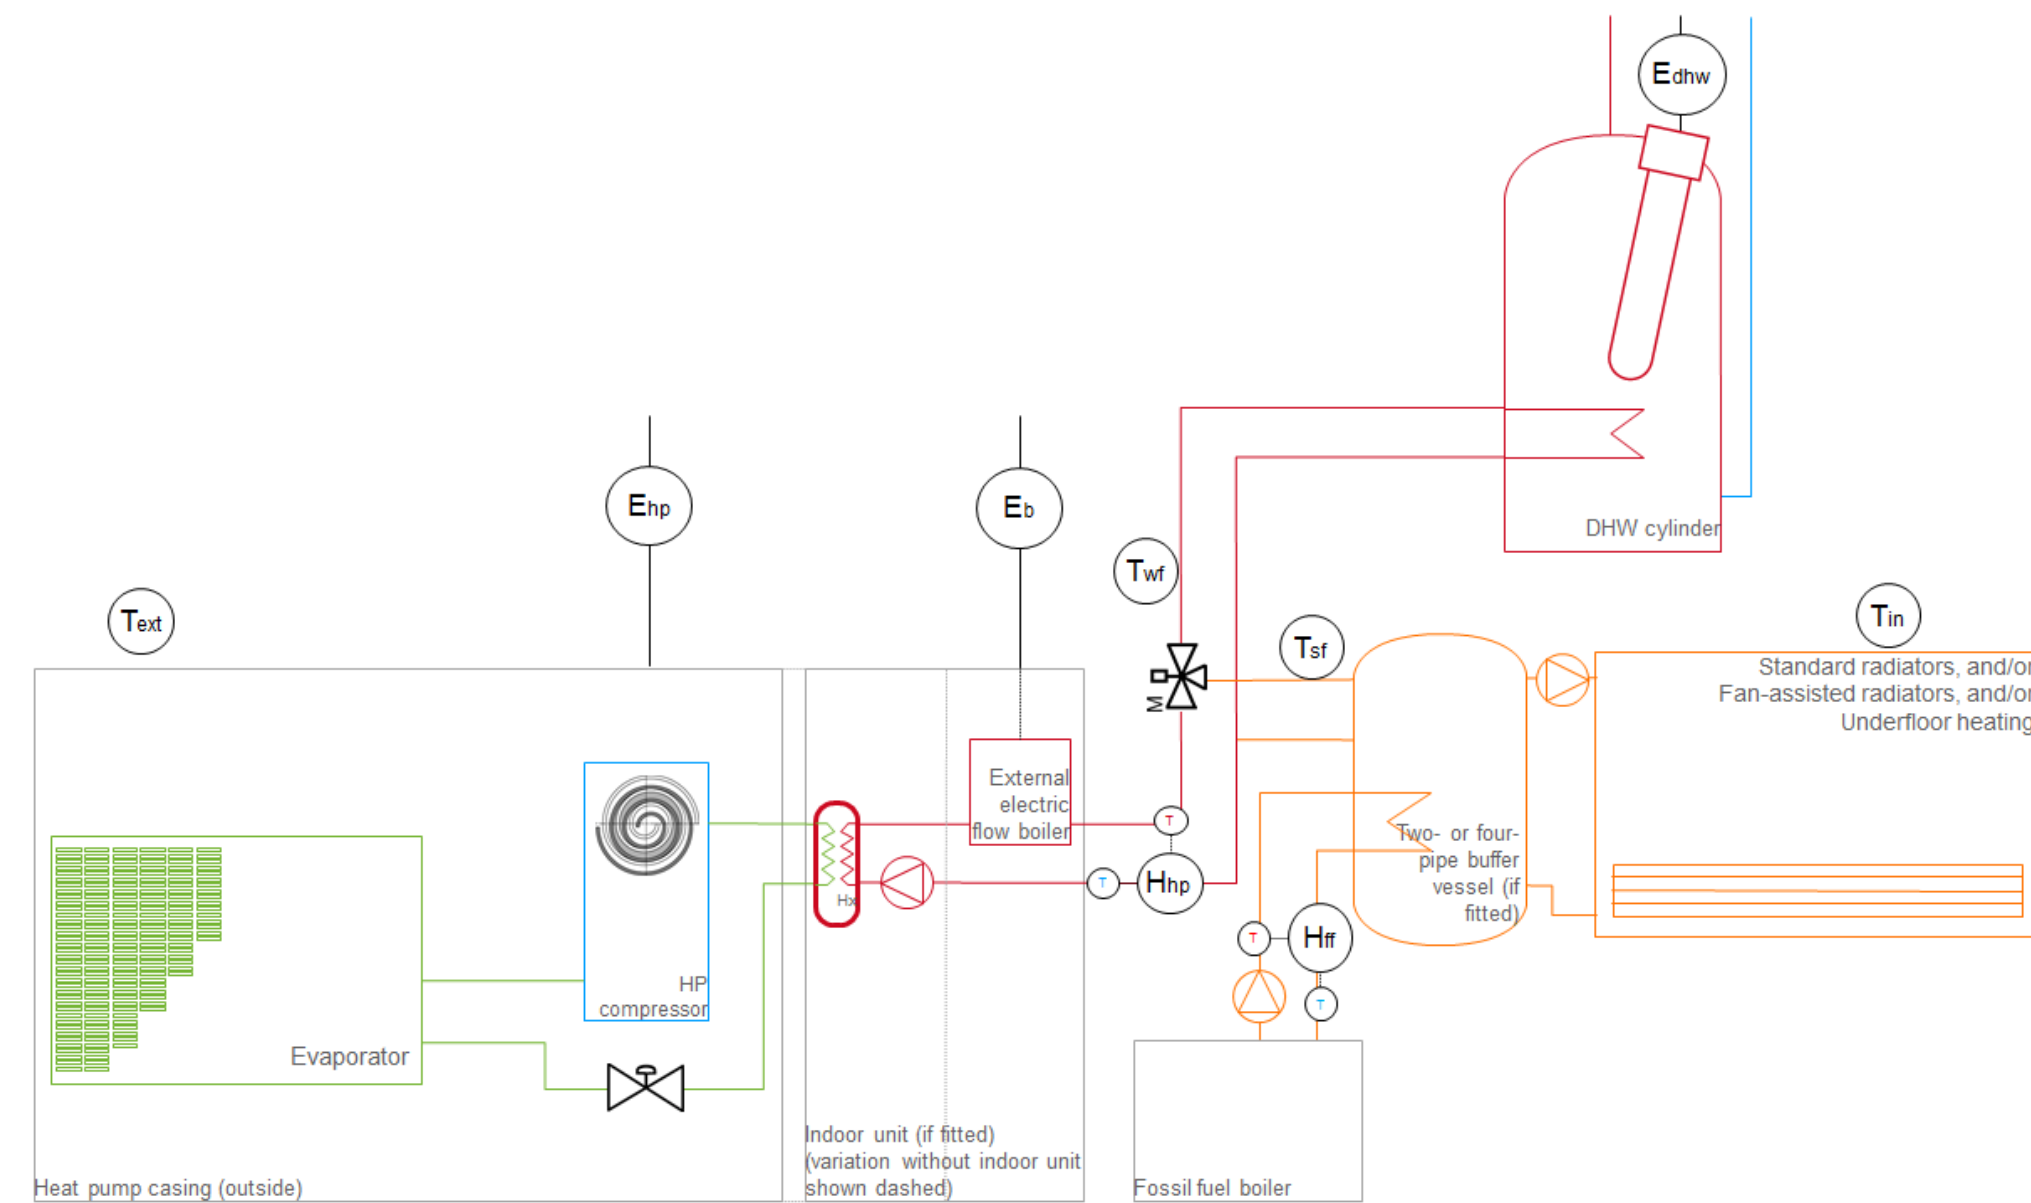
Worked Example 3 - Split-system ASHP with back-up fossil fuel boiler and possible metering
